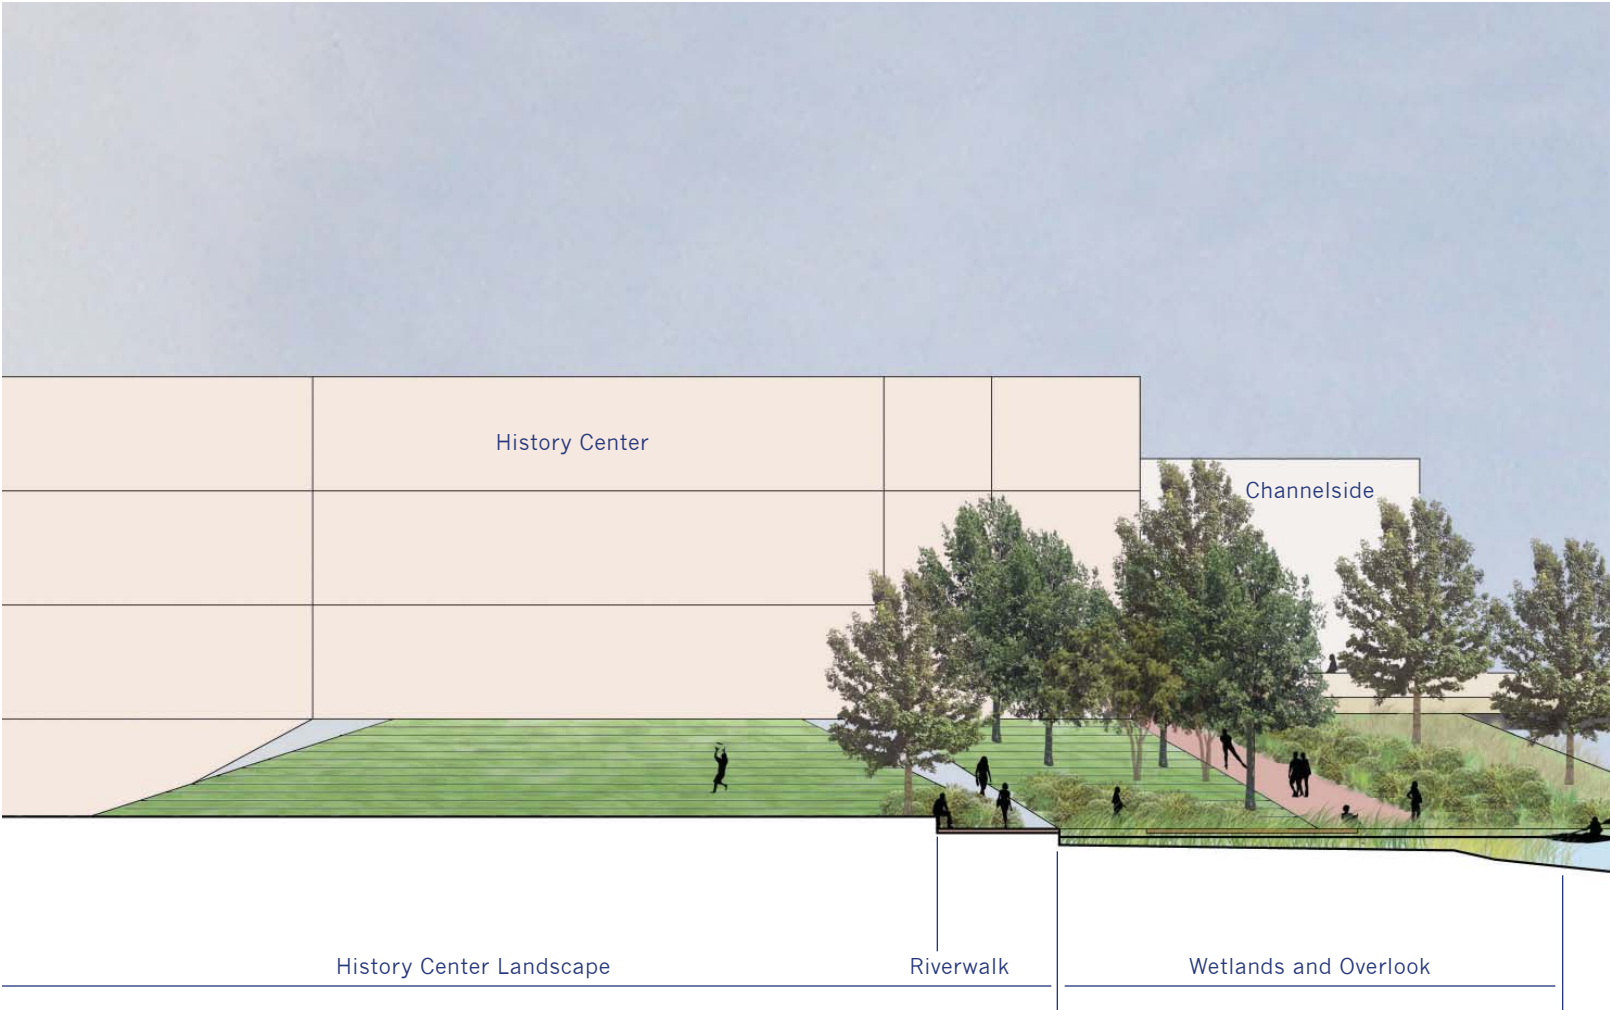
Section view east of Riverwalk adjacent to History Center.
